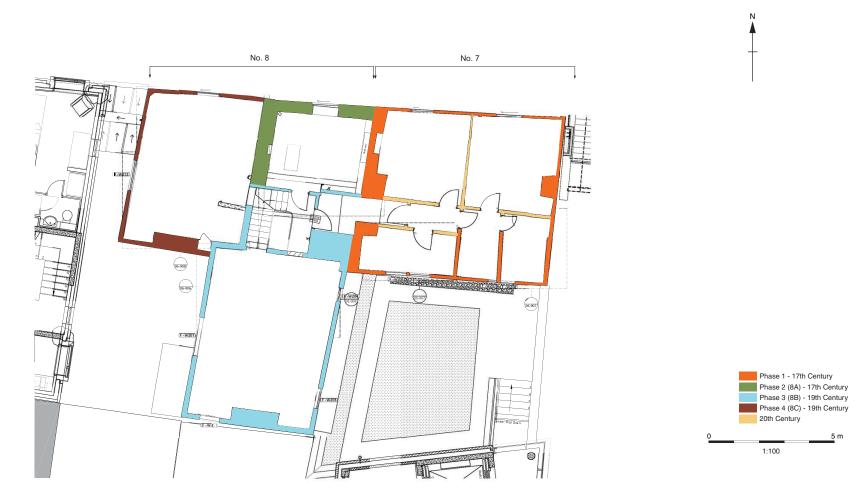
Second Floor plan of Bannister House (based on proposal drawings showing the new Pembroke College development)
